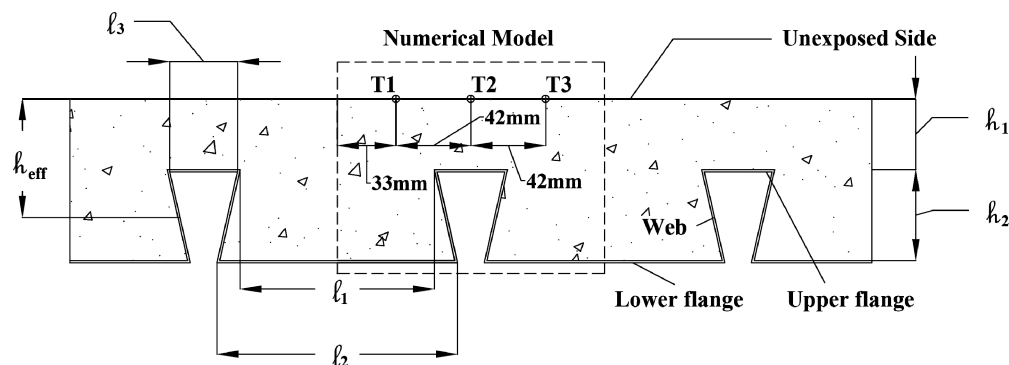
Geometry for the slab with re-entrant steel deck (adapted from [1]).
